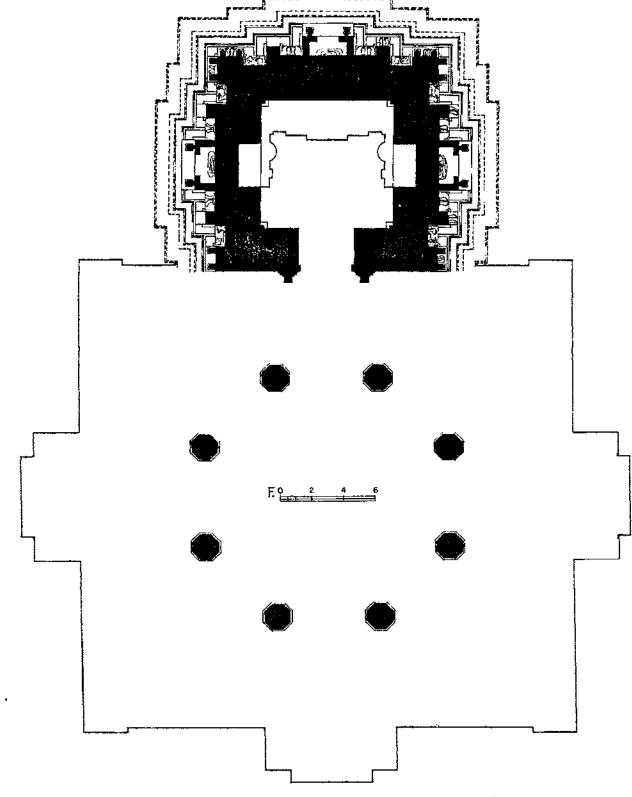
Plan of Navalakhā Pārśvanātha Temple, Pali.
